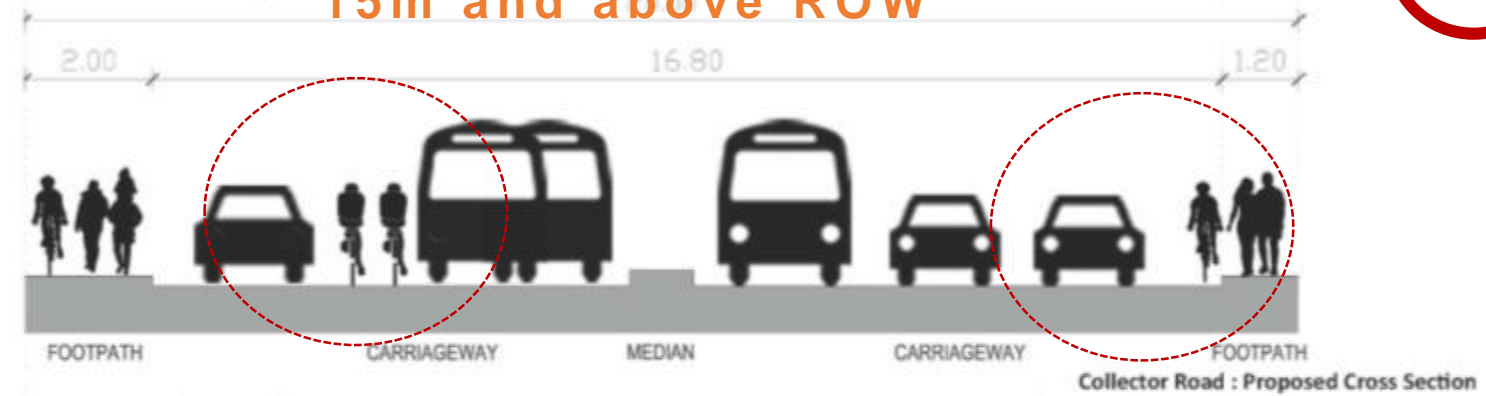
Proposed Typical Cross Section - Mahatma Gandhi Road
